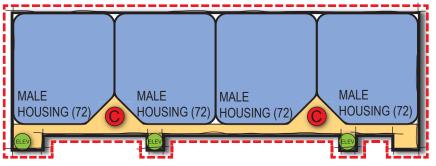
Preliminary OCCC High Rise Floor Plan
